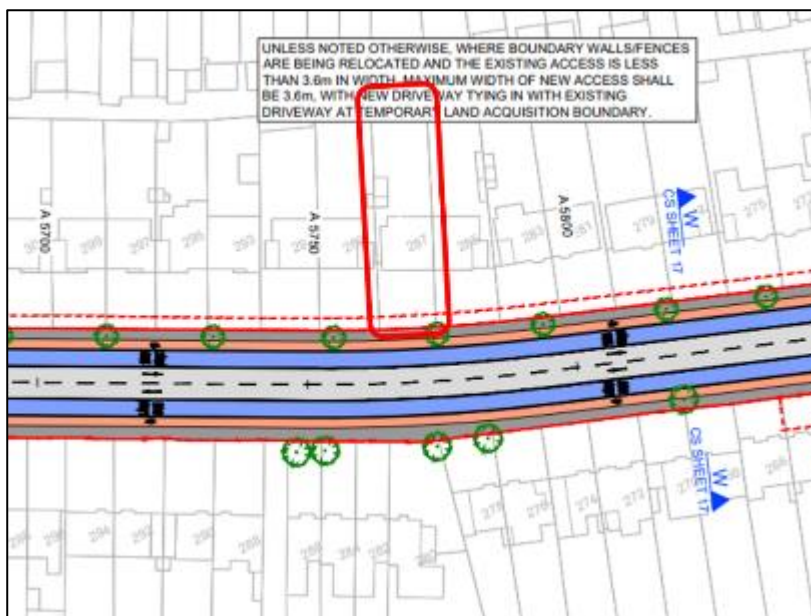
Proposed new Layout at 287 Navan Road
